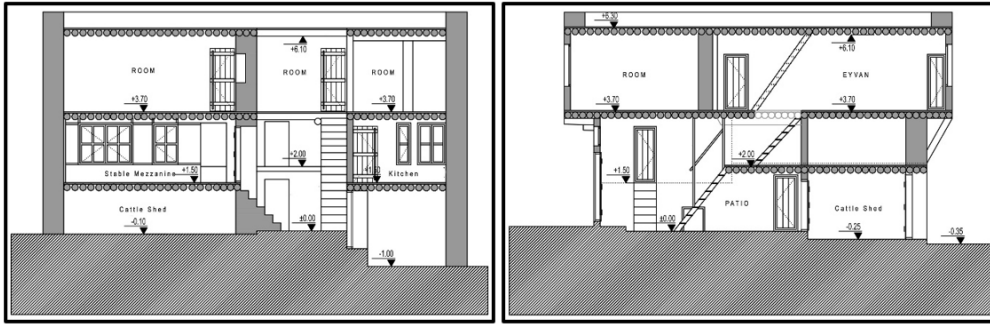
Section Drawings of a Village House with "Stable Mezzanine".
